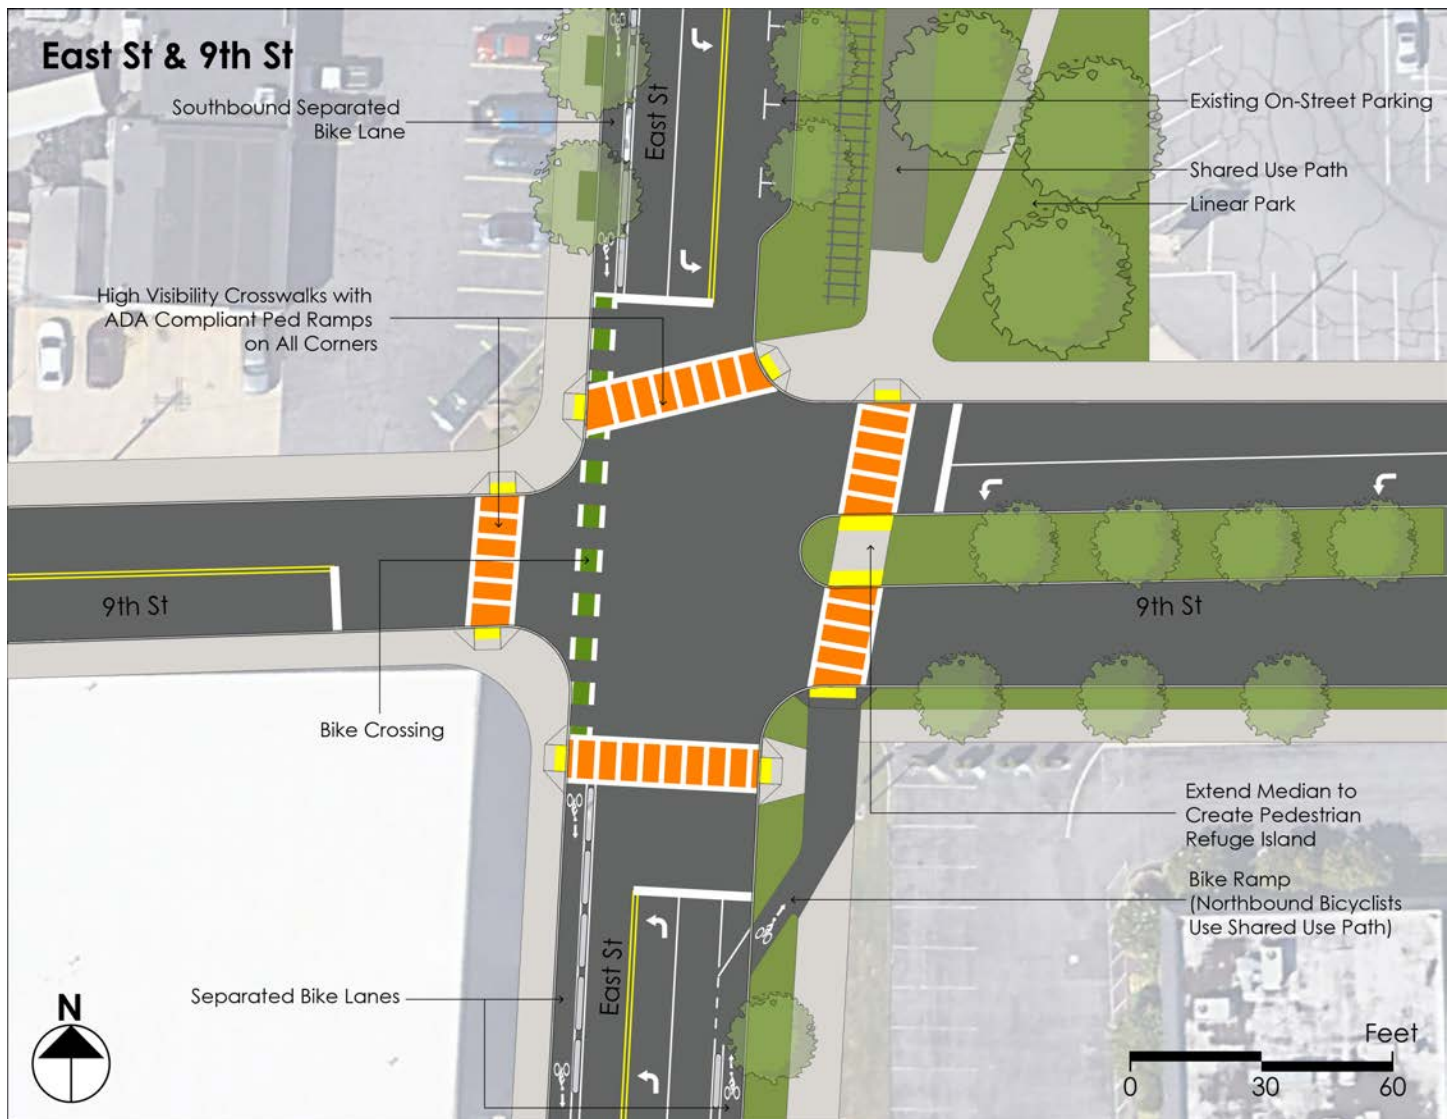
Proposed Intersection Design - East Street and 9th Street
